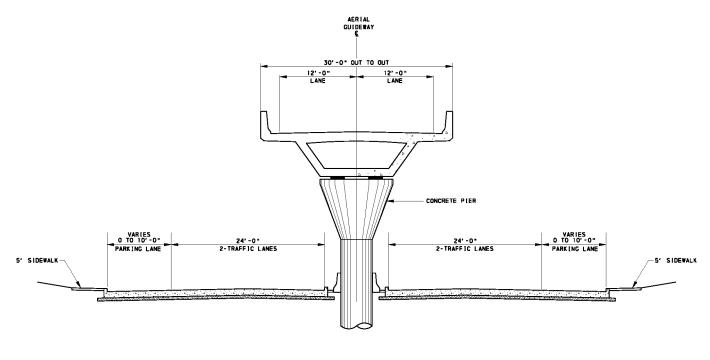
Typical – BRT Aerial Structure on Airline Drive and Greens Road
